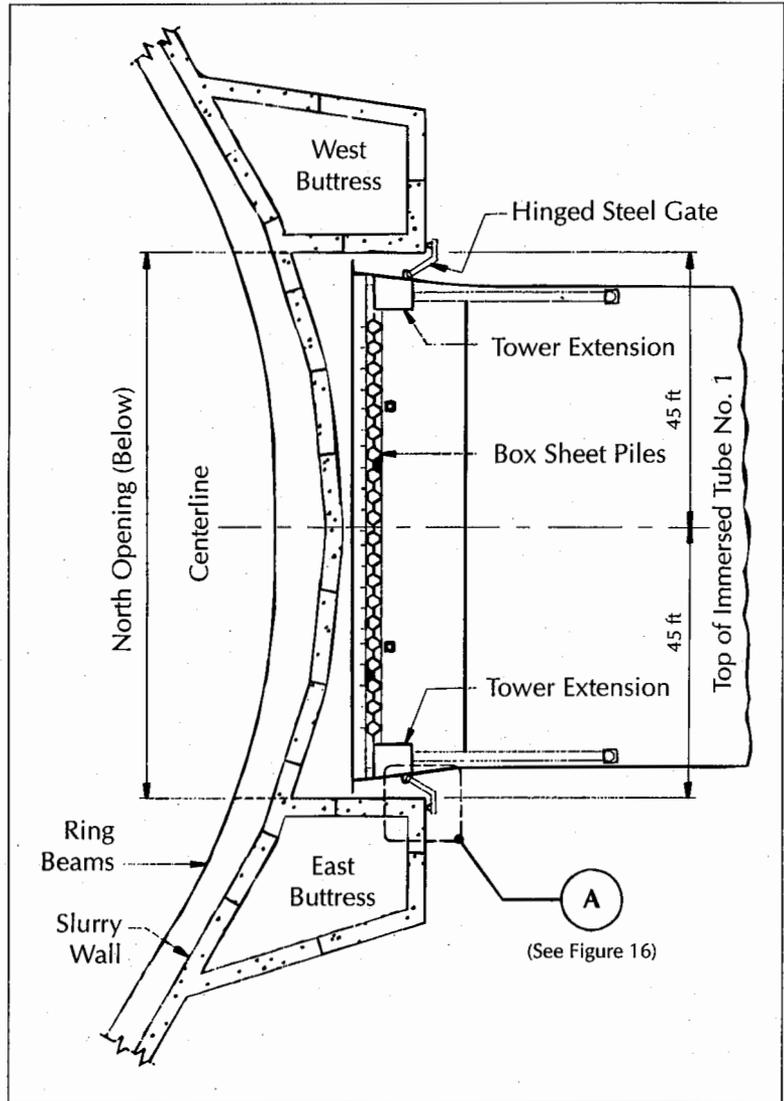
Plan view of the secondary cofferdam adjacent to the main cofferdam.
